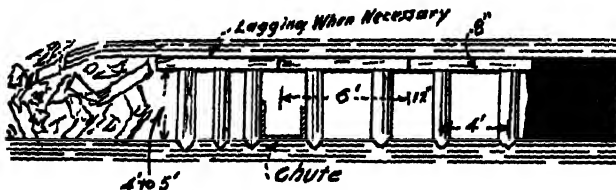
METHOD OF TIMBERING AT THE FACE.
